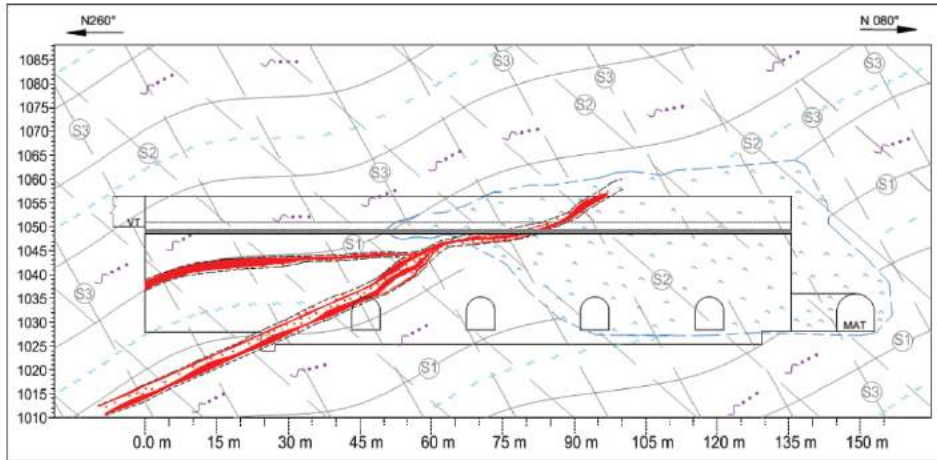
Geological section along upstream wall of transformer hall cavern showing disposition of shear zone
